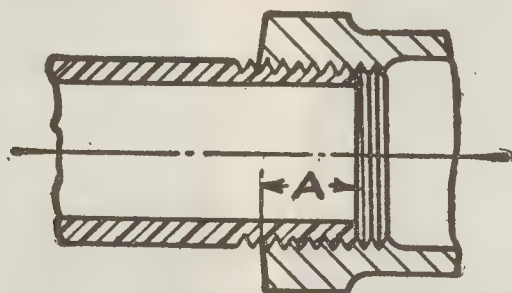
,316.—Screwed joint made up showing length A, of thread on pipe that is screwed into valves or fittings to make a tight joint, according to table by Crane Co. on page 2,131.
